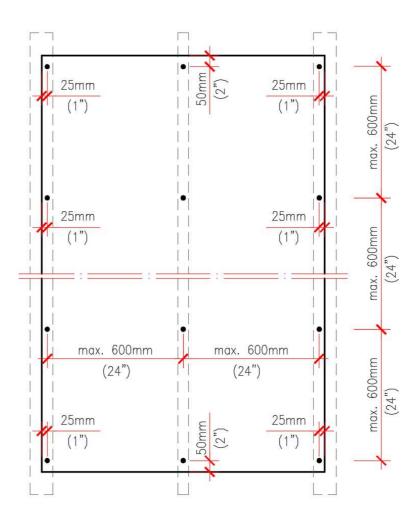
Screws/rivets location (Distances to the edges and between elements)
